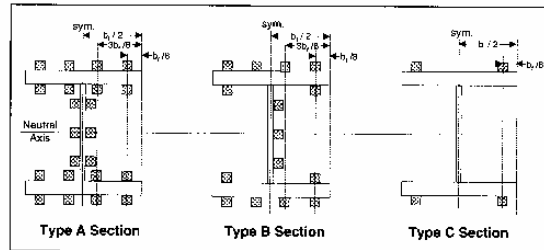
Location of resistance strain gages at instrumented sections A, B and C
